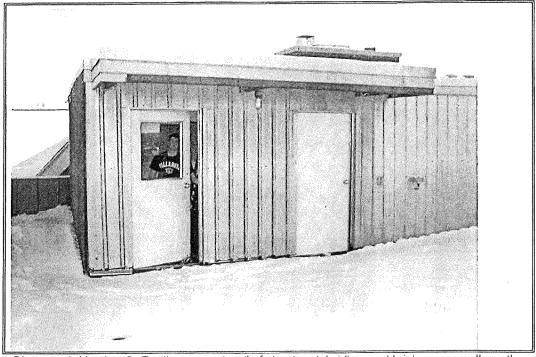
Photograph Number 4: East side elevation where chimney is located, note penthouse at roof.
